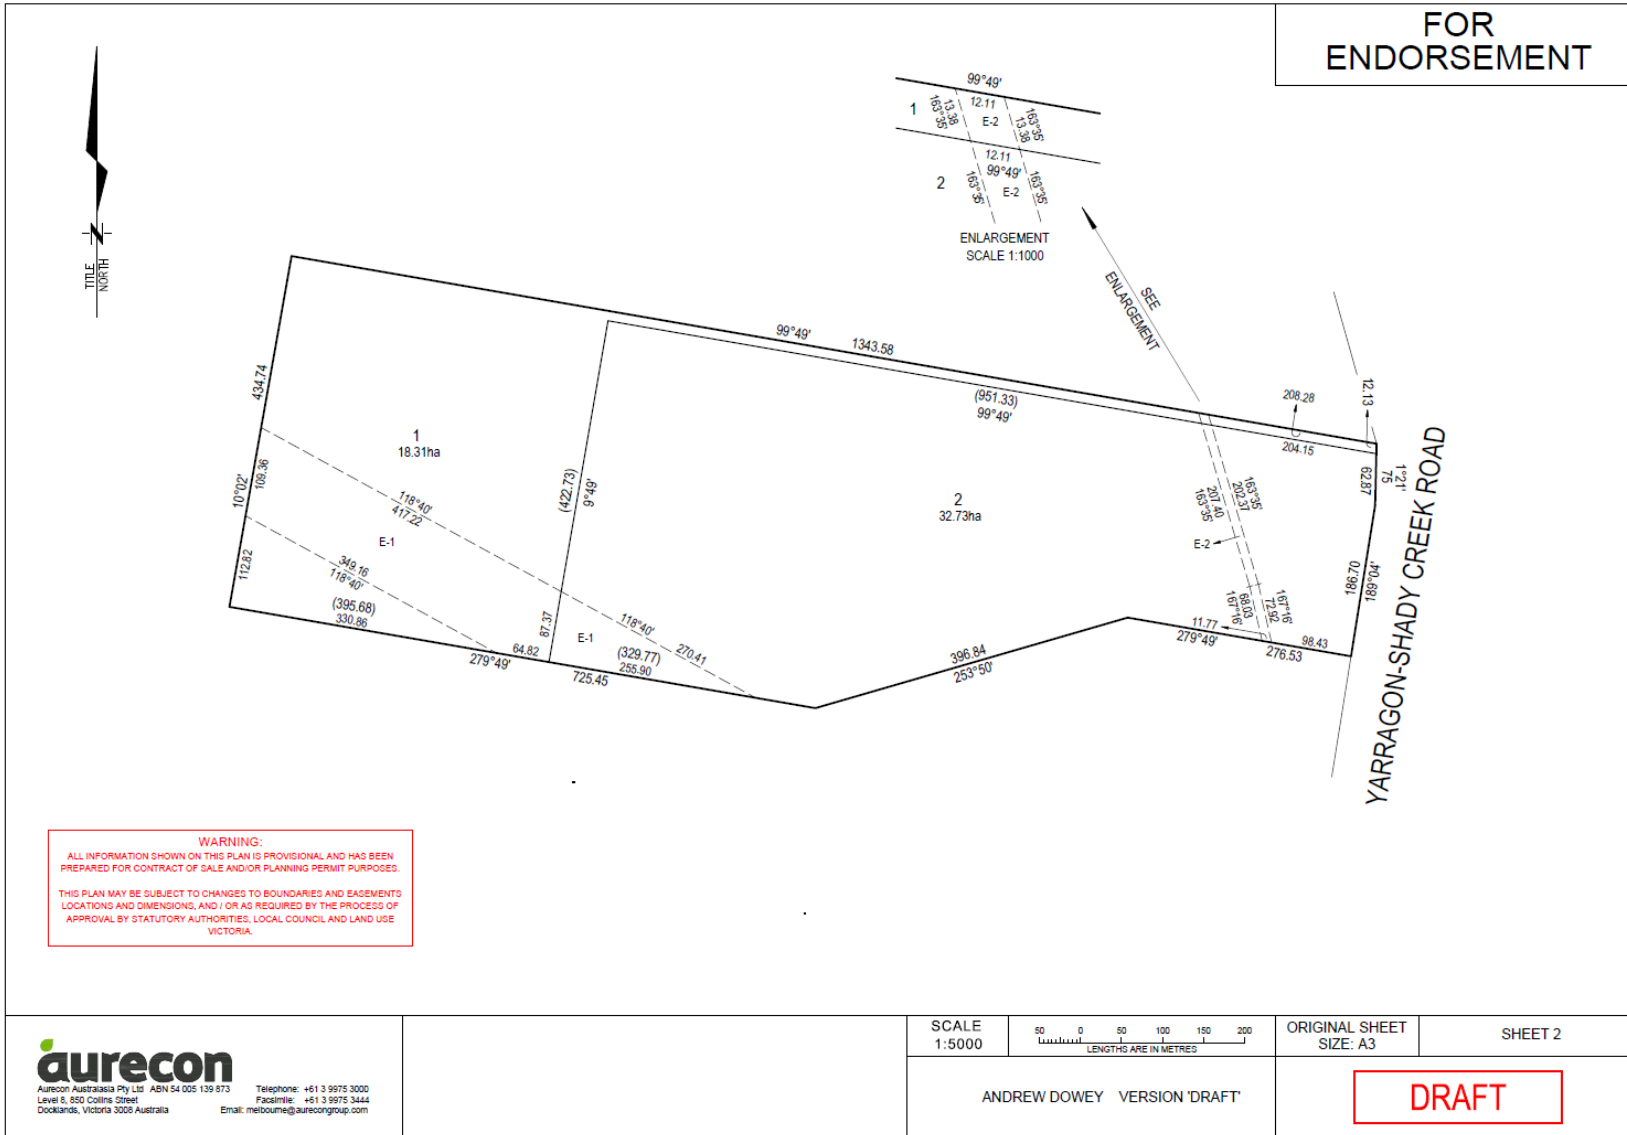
Proposed Plan of Subdivision - 713 Yarragon-Shady Creek Road, Yarragon
